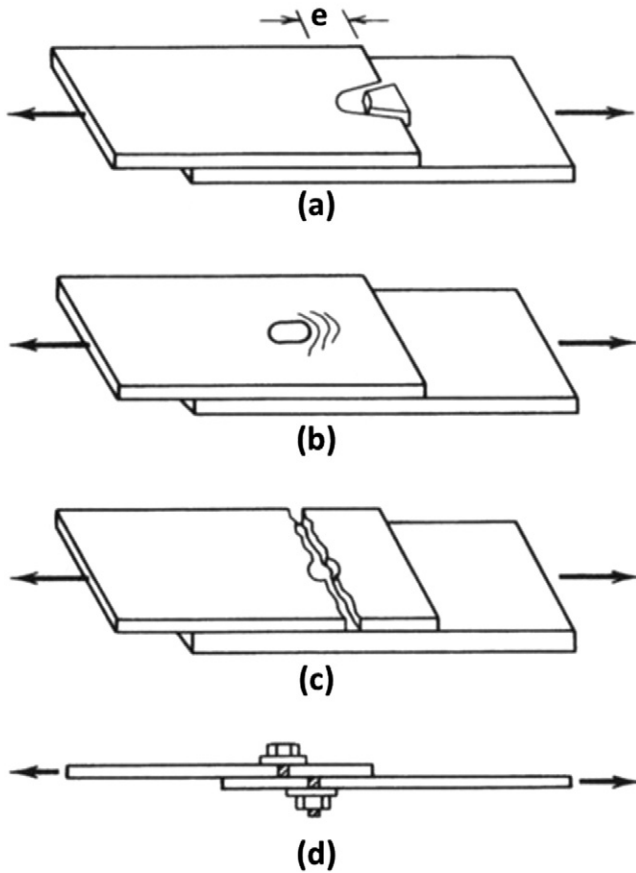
Failure modes of bolted connections: a) tear-out failure of sheet, b) bearing failure of sheet, c) tension failure of net section, d) bolt shear failure [2].
